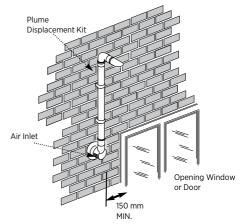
Installation Position of Plume Displacement Set to Window or Door
